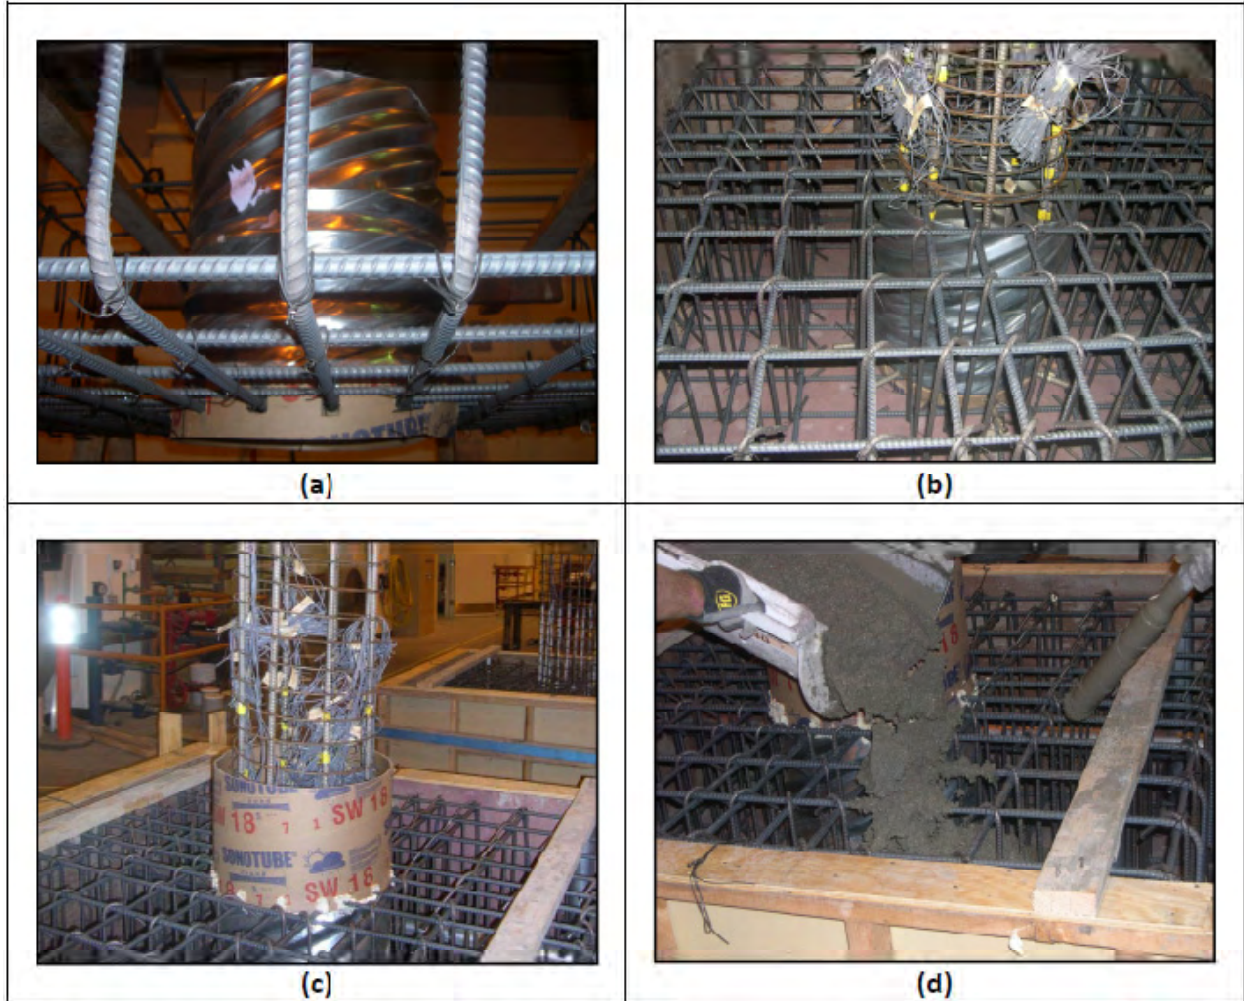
Construction photos of TS-2: (a) side view of corrugated steel pipe; (b) top view of corrugated steel pipe; (c) foundation and column reinforcement cage; and (d) pouring of foundation concrete.
